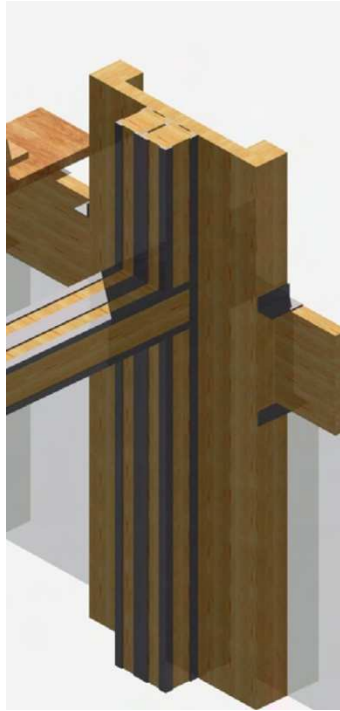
Sketch of the detail connection between timber-steel beams and supports (207)
